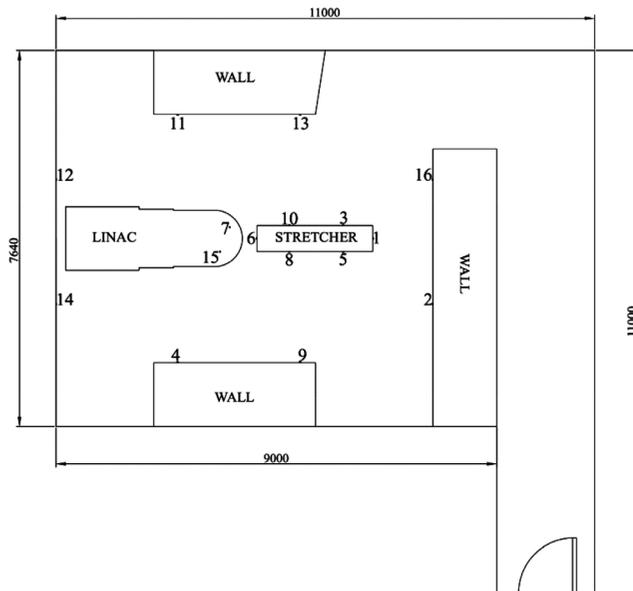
Schematic drawing of the dimensions of the treatment room and the position of the sixteen devices. The dimensions are in millimeters.
